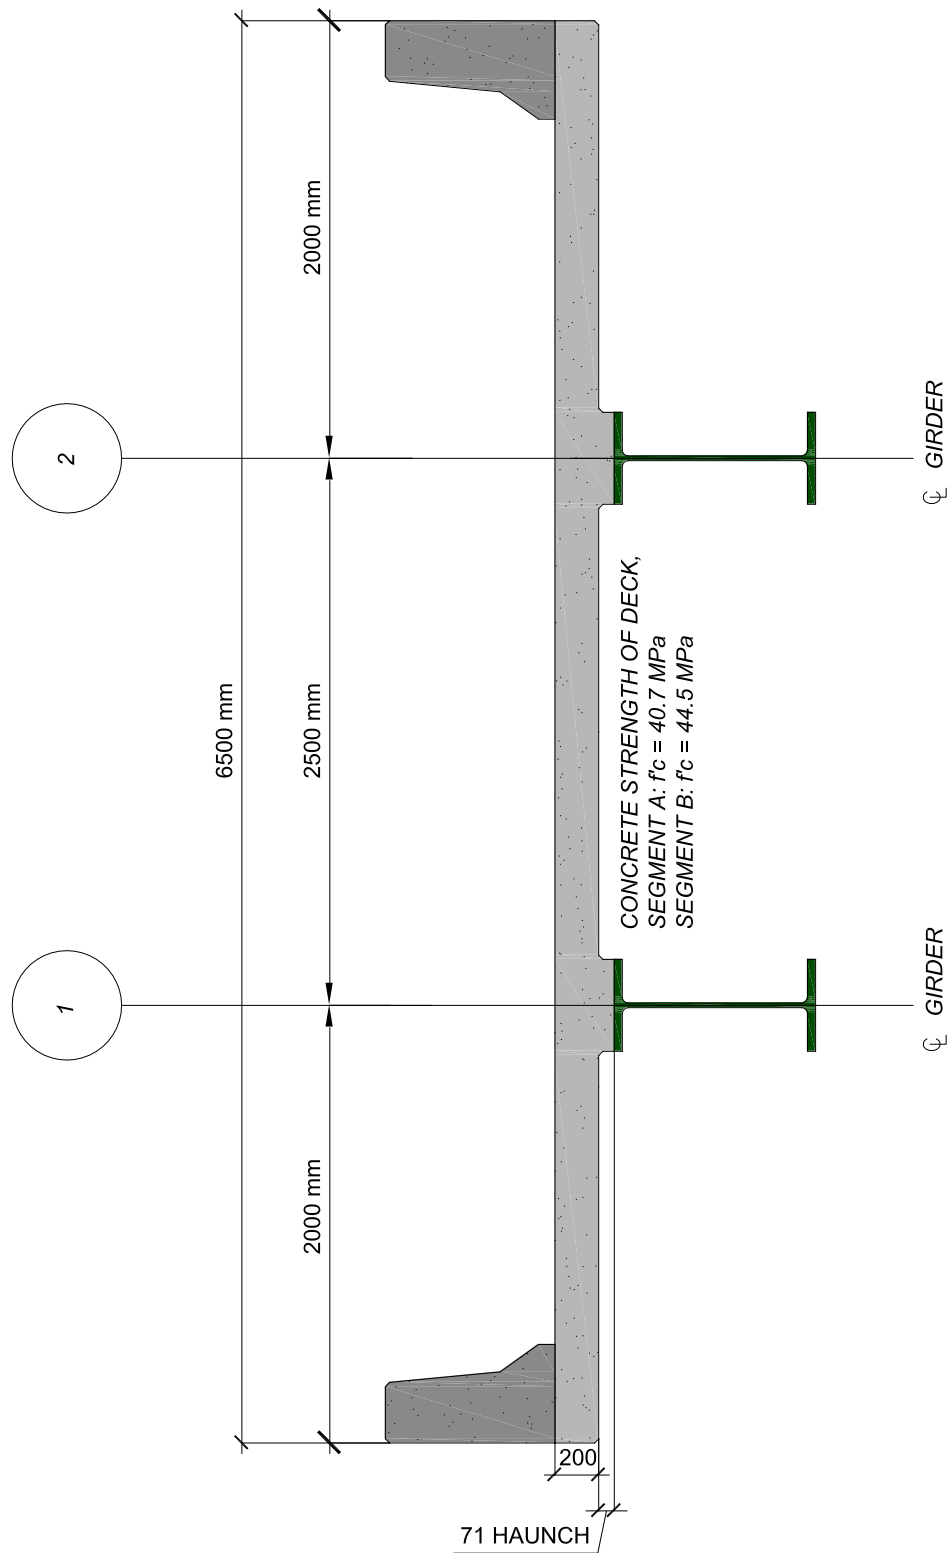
Cross section view of concrete bridge deck slab schematic used in this experiment
